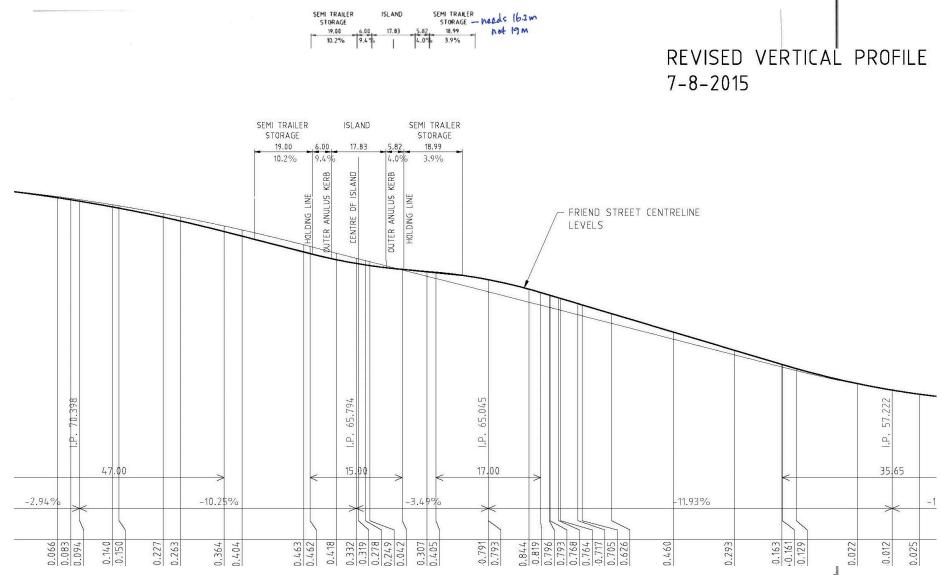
Main Road Intersections - Approach Grading on Side Roads
